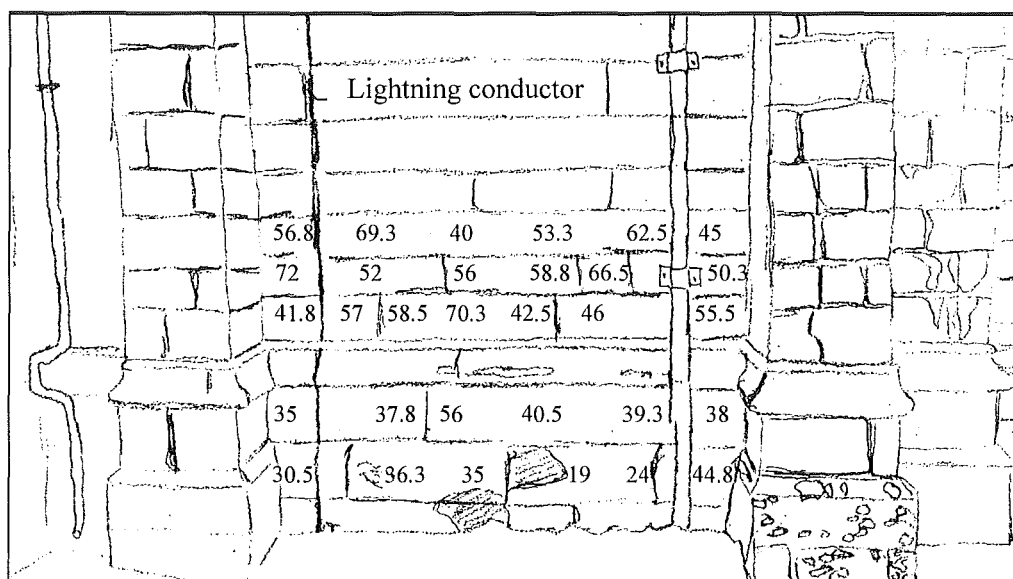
Sketch plan of Widecombe-in-the-Moor, north facing wall.
